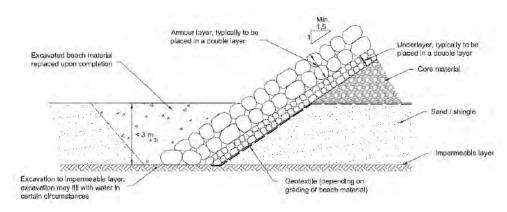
Cross-section of a Typical Rock Revetment Seawall (CIRIA, 2007)
